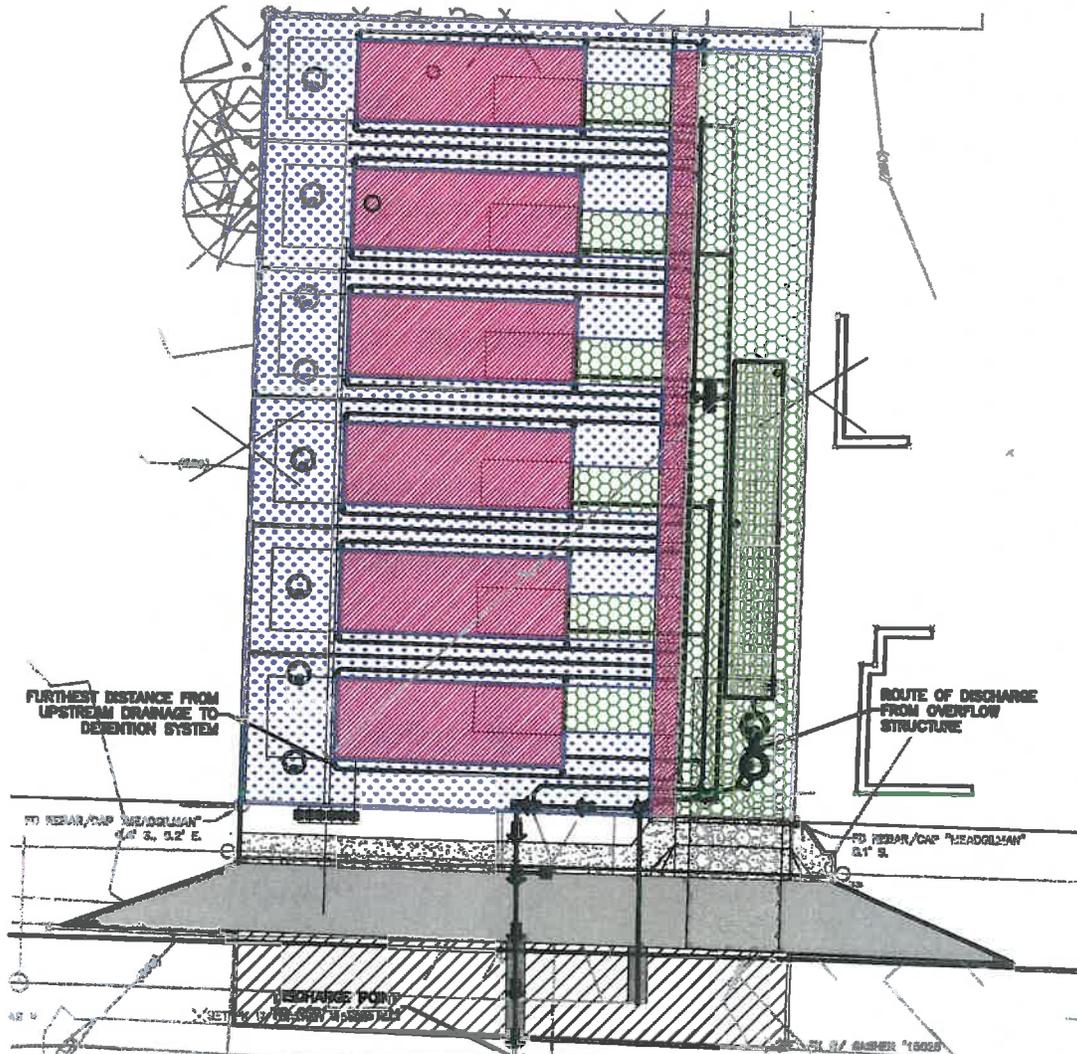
DEVELOPED SITE DRAINAGE BASIN MAP
